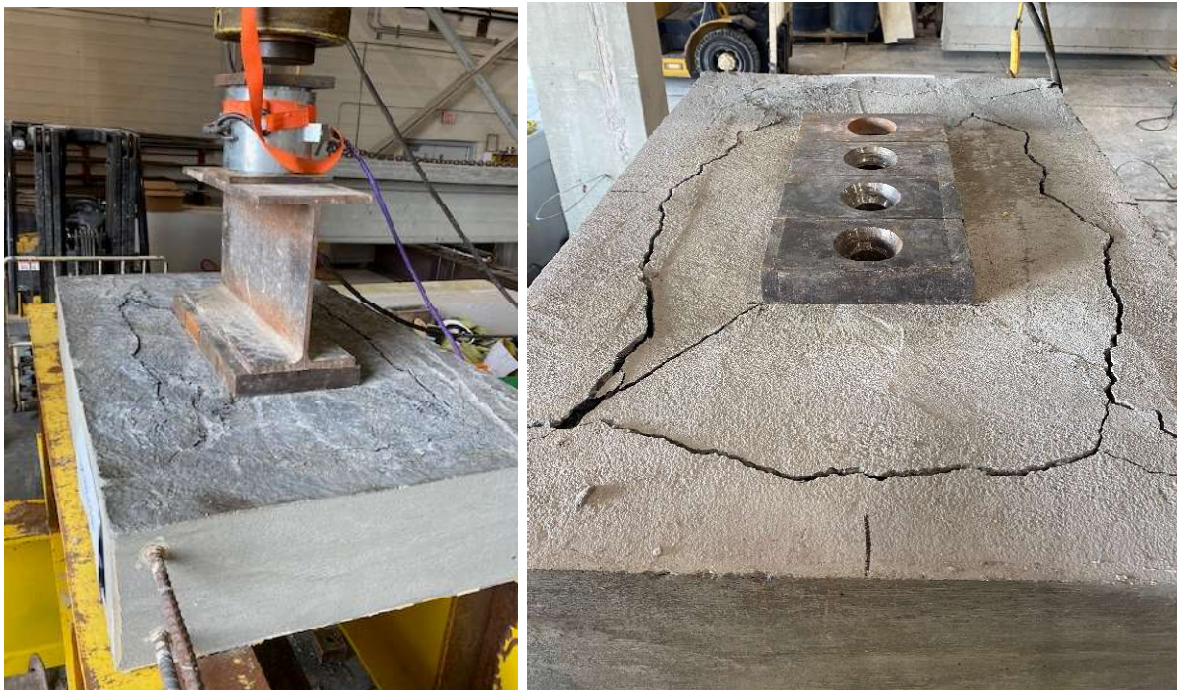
Punching Shear Failure Mode in UHPC Slab (left) and CC Slab (right)
